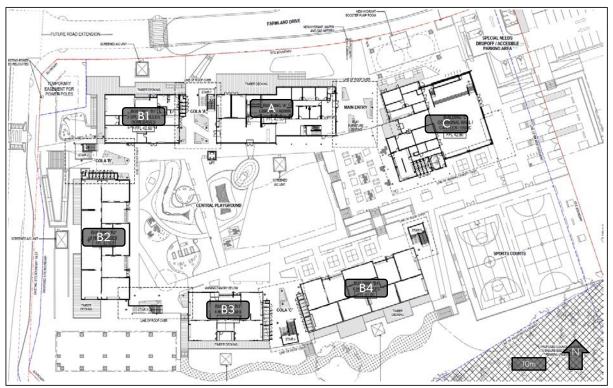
| Proposed ground floor layout (Base source: Applicant's SRtS2 2020)
